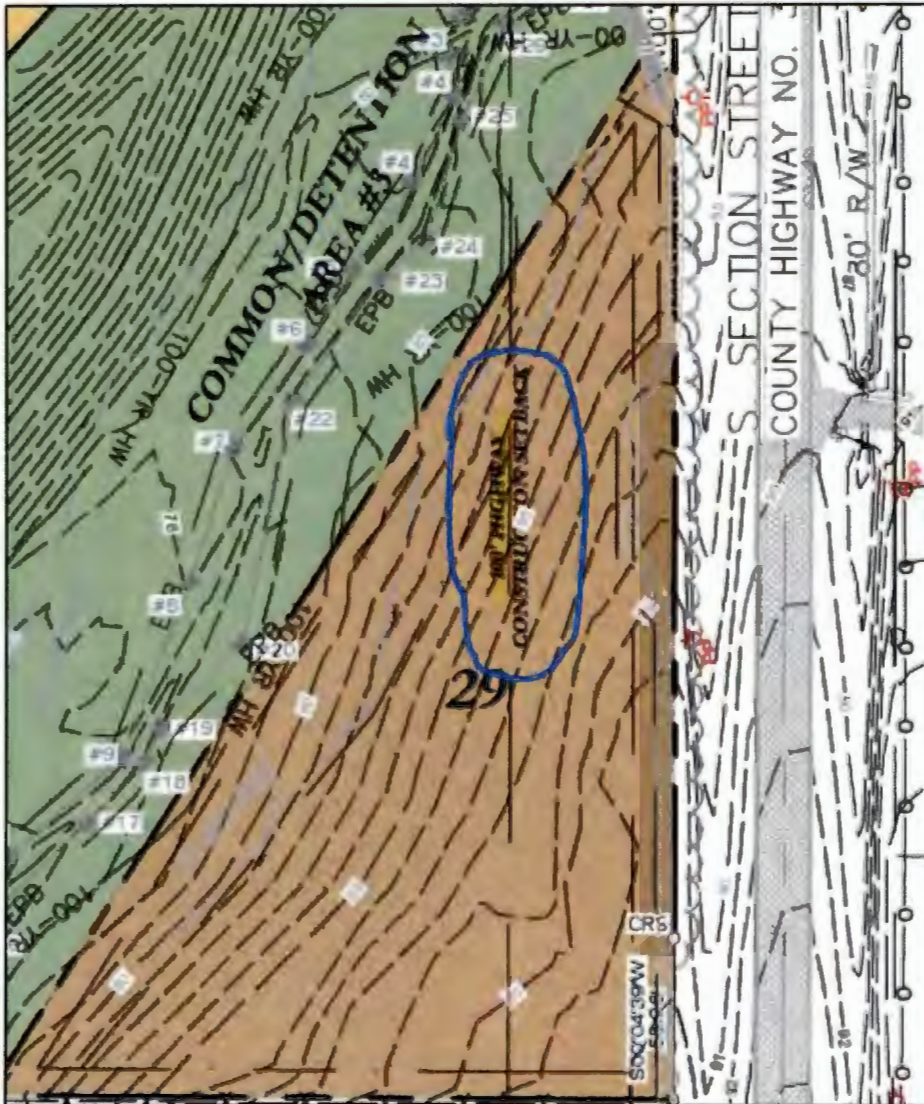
Original Site Plan excerpt with 100ft front setback line.
